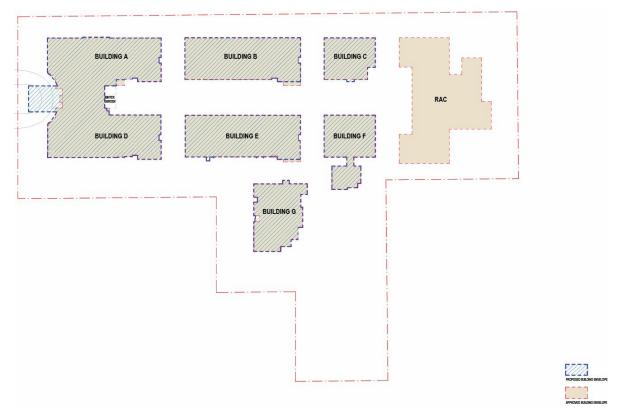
Site Plan with proposed envelope building envelope overlay (blue) and original approved (red) building envelope, prepared by AUDAA.
